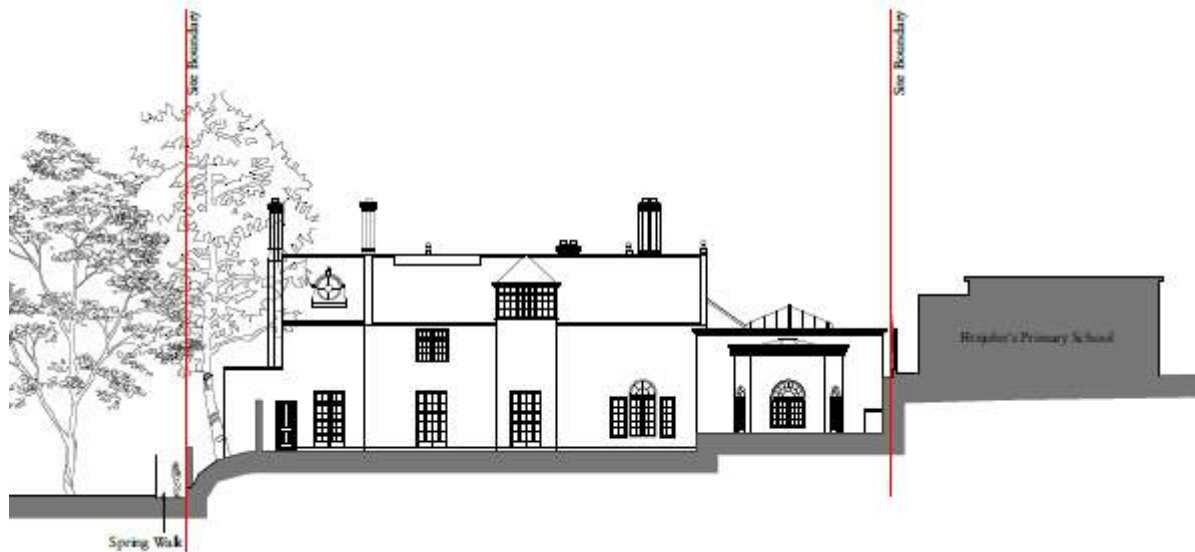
Excerpt from Charlton Brown Architects drawing no. A-PL-00-311 showing east (rear) elevation
